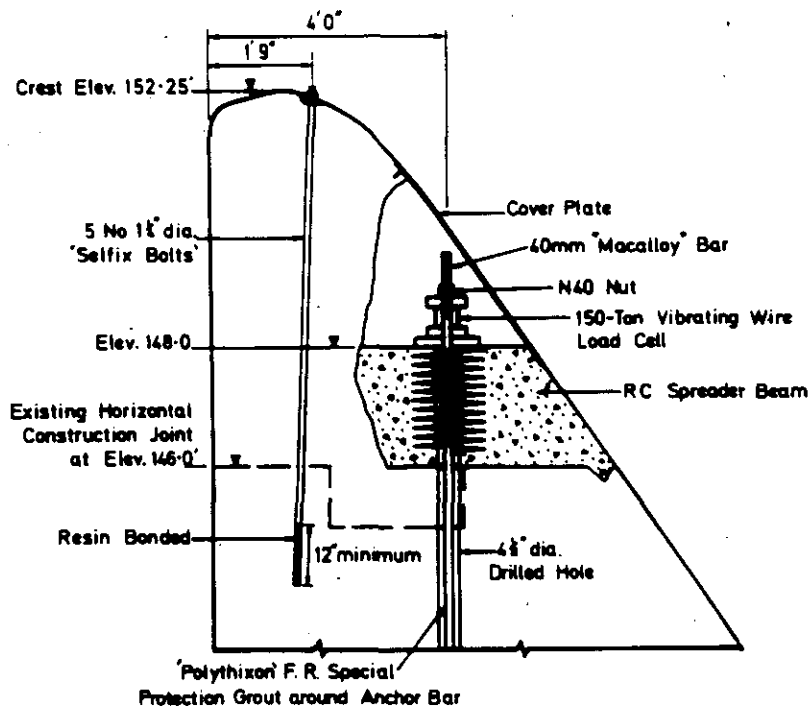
Basic Detail of Spreader Beam and Tendon Anchorage at Crest of Block 6.
